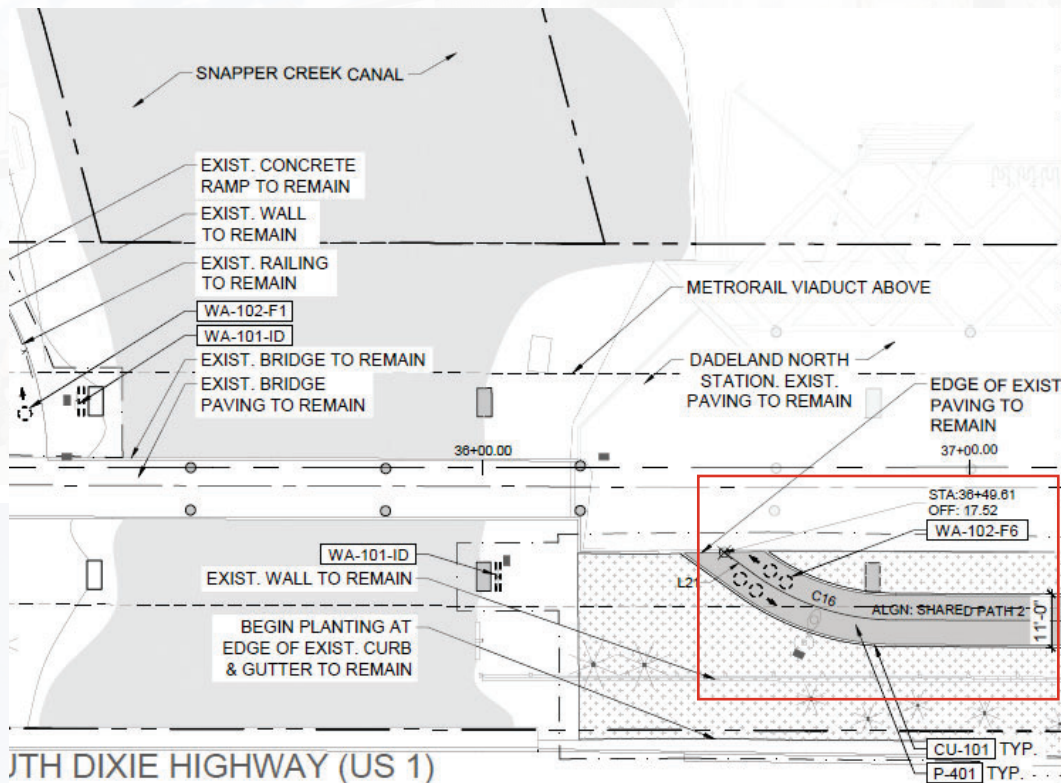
Proposed Underline and Existing Glass Wall Location
